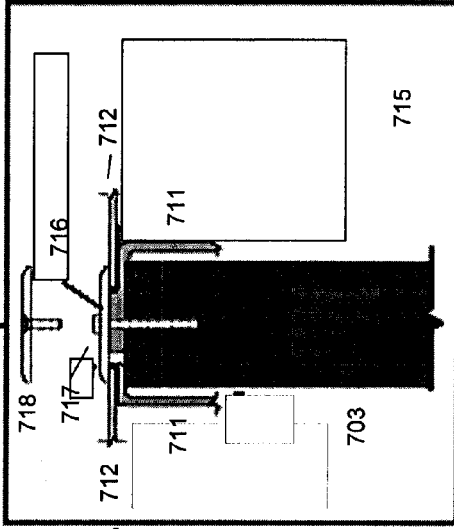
Latitudinal Cladding Detail for Mounting Structure Interface
